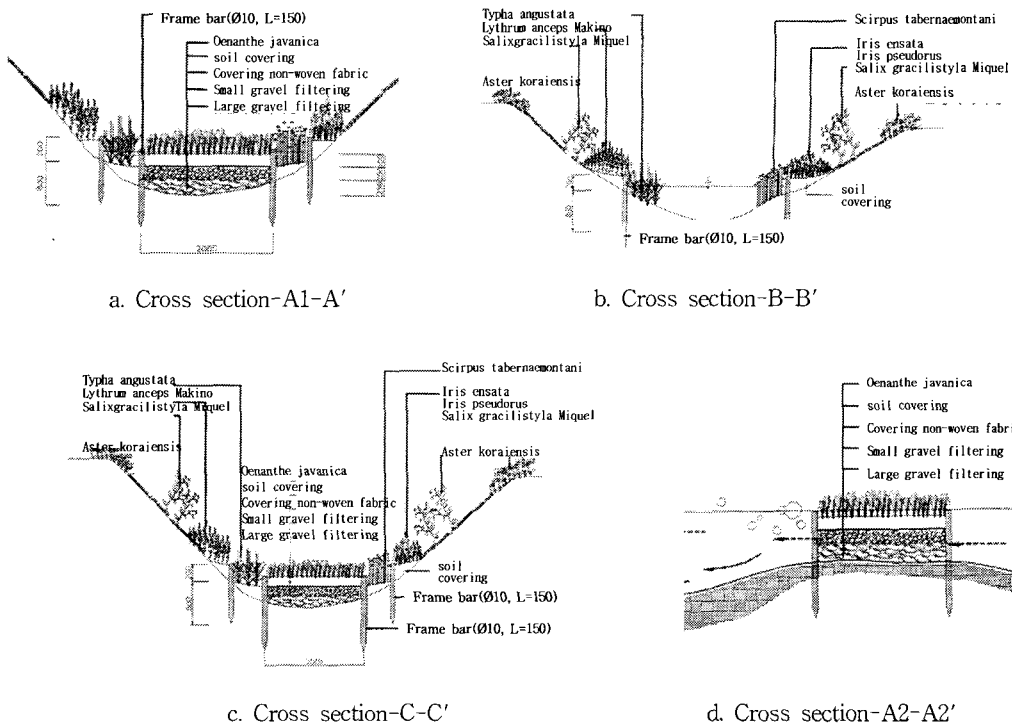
Cross sections at the water collecting points(Non-Scale).
